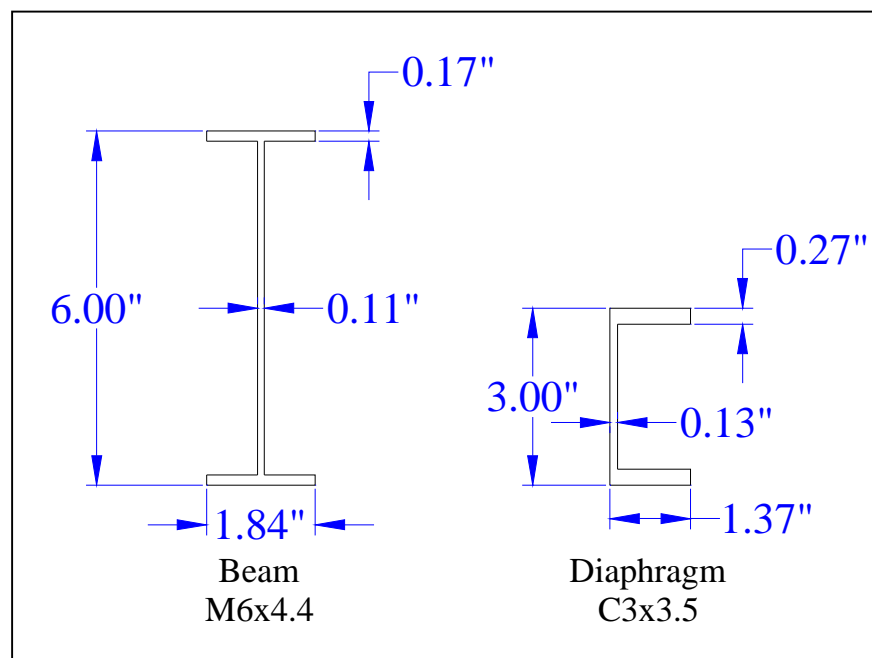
Scale bridge girder and diaphragm member cross sections
